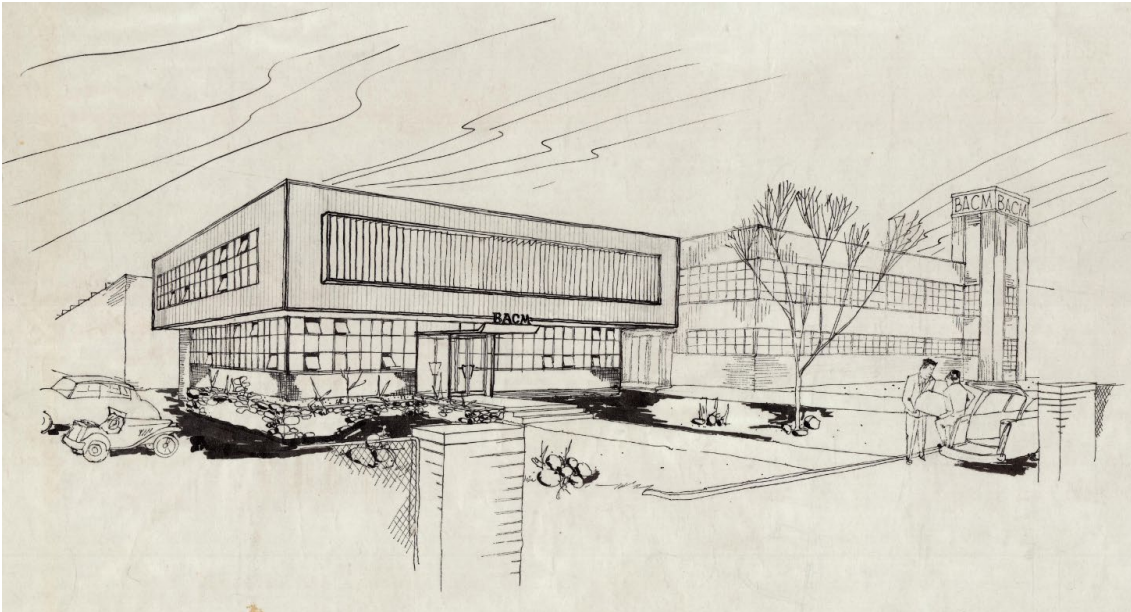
Perspective sketch of the administration building dating to 1959 illustrating the form of the building and the original landscape setting
